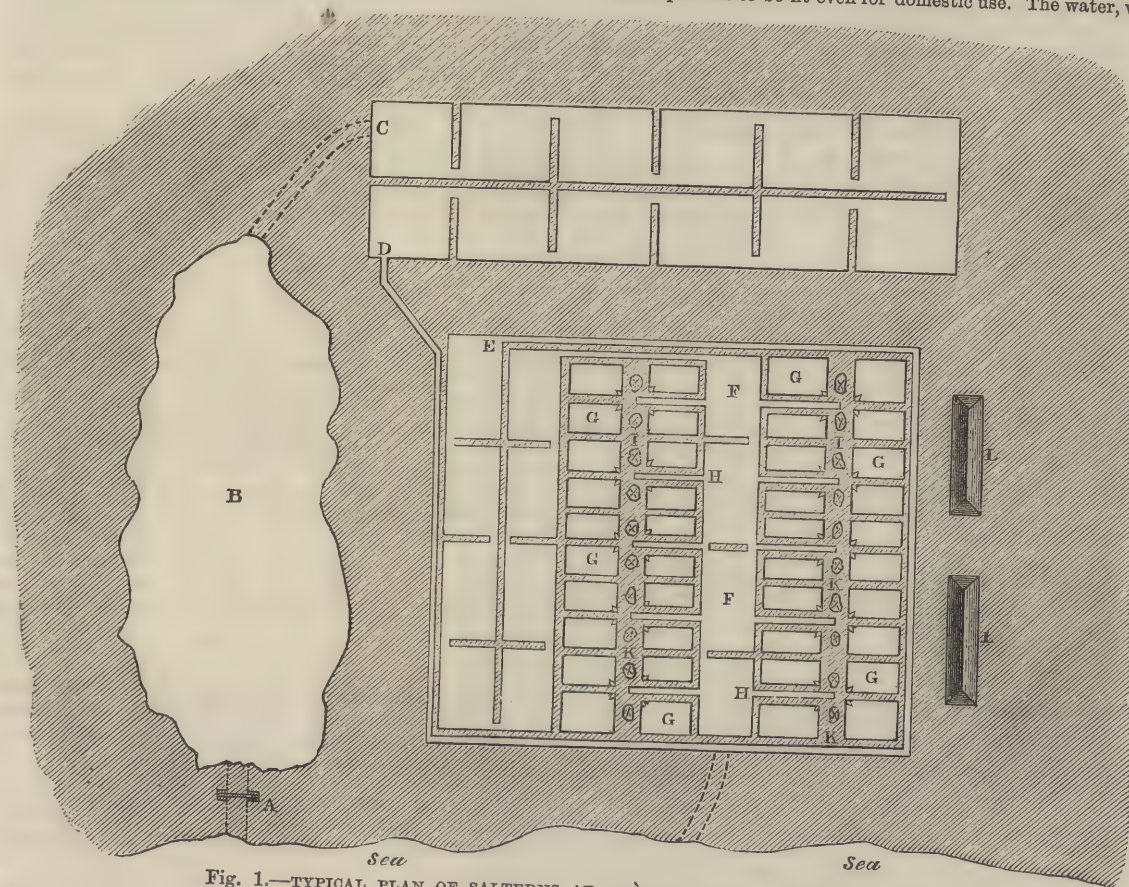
TYPICAL PLAN OF SALTERNs AT HYÈRES, CAGLIARI, TRAPANI, ETC.
